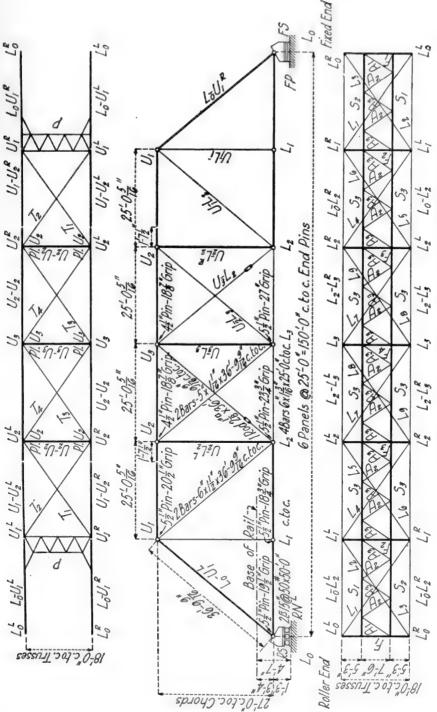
Standard Marking and Erection Diagram for a Truss Bridge.
